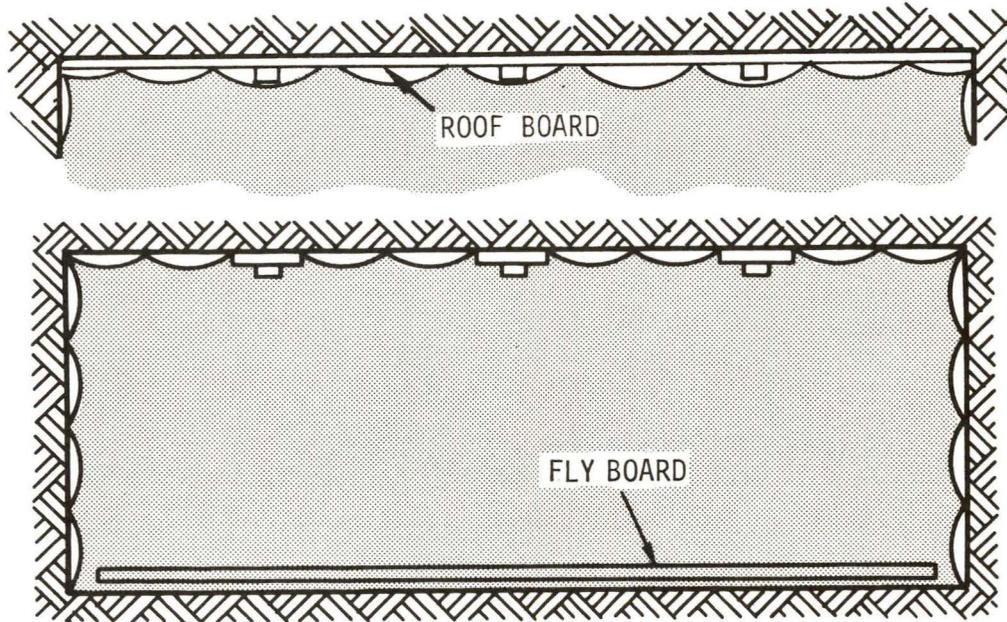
Type B check curtain - curtain nailed to roof board or roof bolt plates with an additional "fly" board at bottom.
